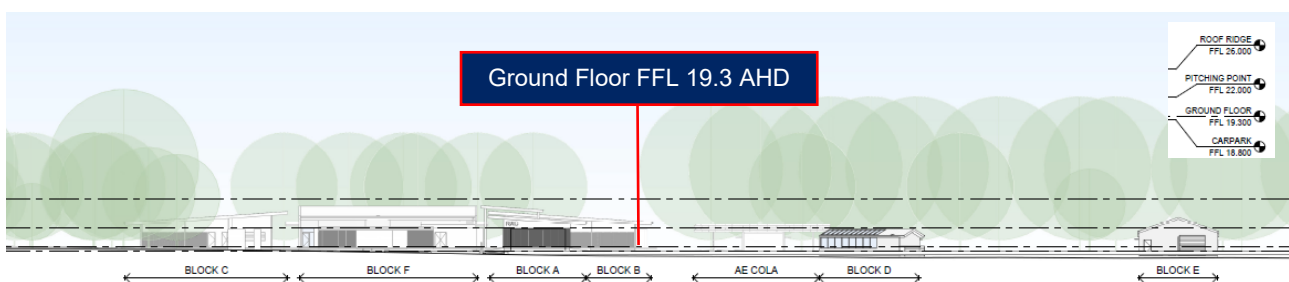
Section of the RAC and ground floor FFL (source: NBR Architecture)
